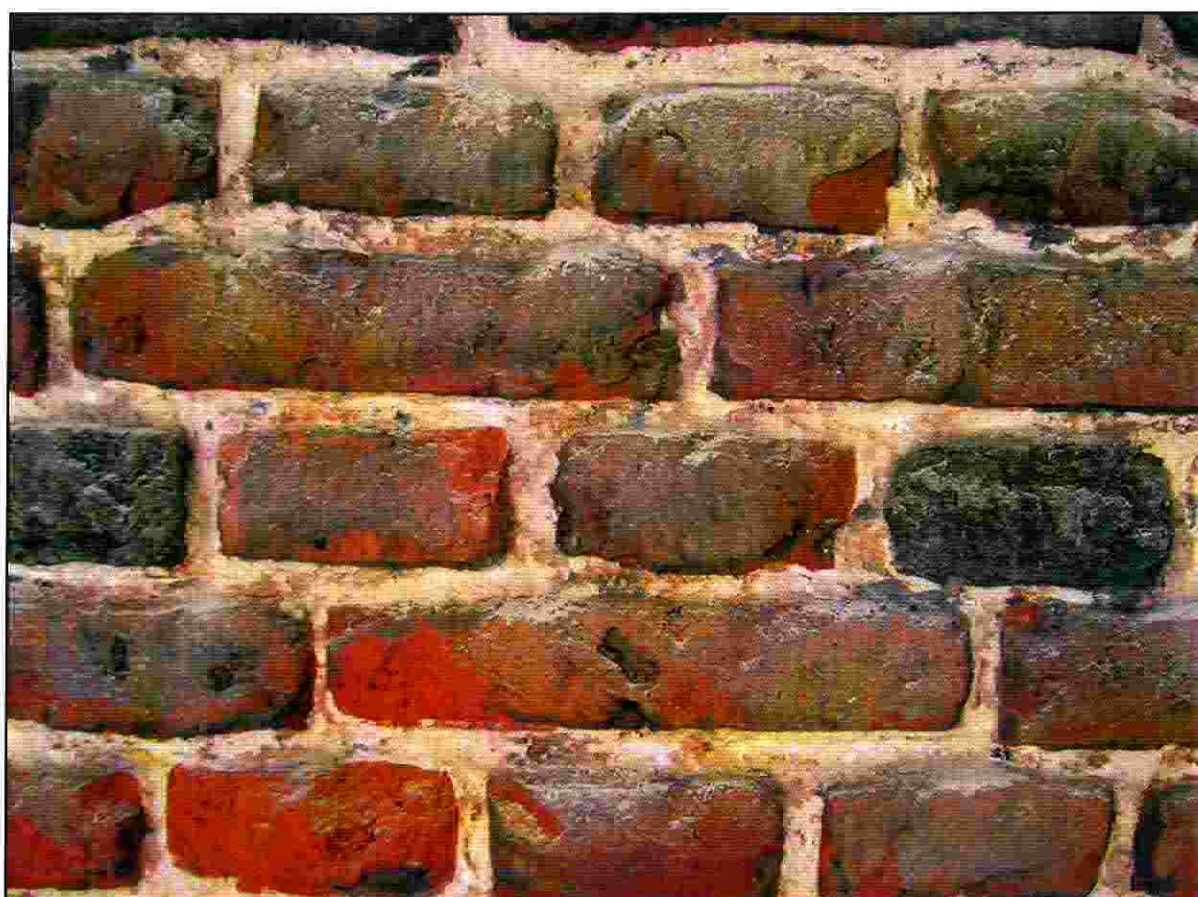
Chapel Court, North Facing Elevation - Red paint on original bedding mortar
